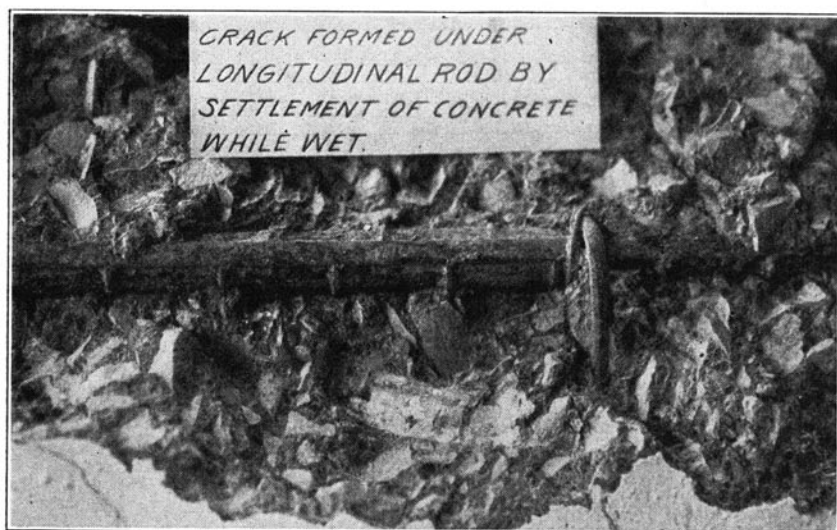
VIEW SHOWING CRACK UNDER LONGITUDINAL BAR OF BEAM 376.2, DUE TO SETTLEMENT AND SHRINKAGE OF CONCRETE IN SETTING
